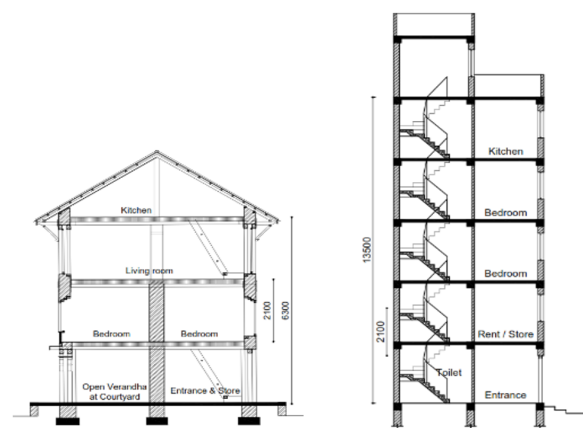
Typical Traditional (Left) & Modern (Right) Sections
